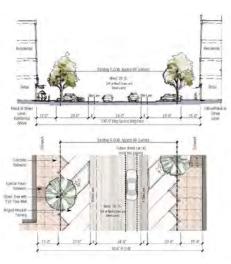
Street section: 2 traffic lanes, 2 bike lanes, angle parking (Source: JHP, 2009)
